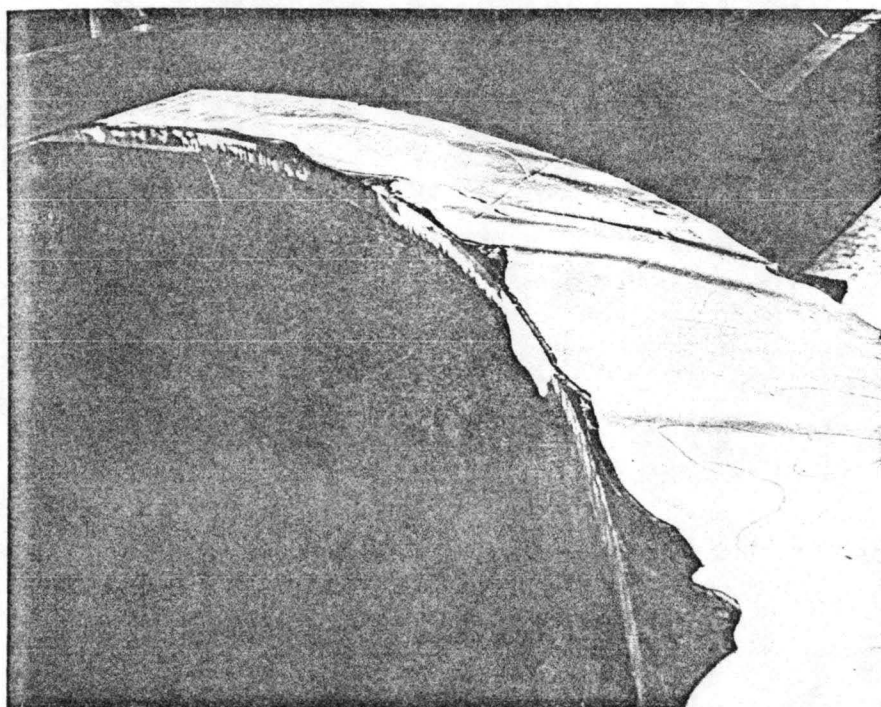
Leveling Grout on Steel Ring at Top of Specimen P6
